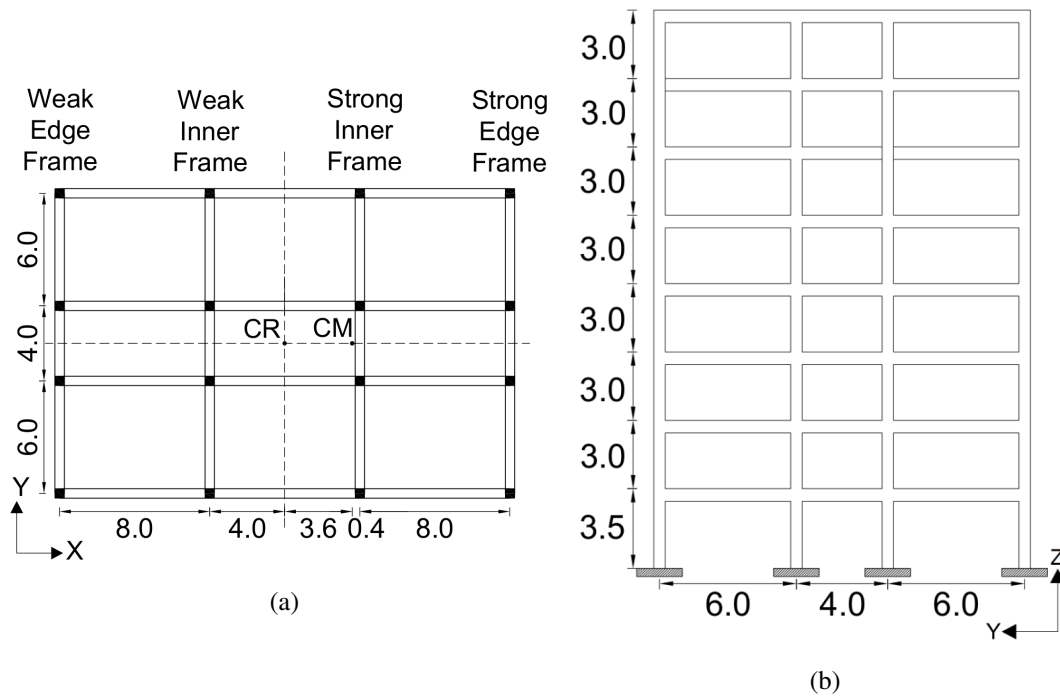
Typical story plan of the eight story mass-asymmetric structure and elevation view of the frames in the direction of analysis. Center of Rigidity (CR) and Center of mass (CM) locations (same for all stories) are marked on the plan. (Units in meters)
